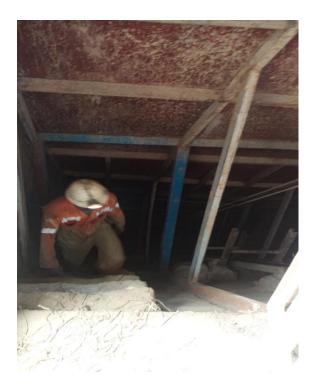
Working Underground with Limited Lighting Using Torches and Ventilation Systems
